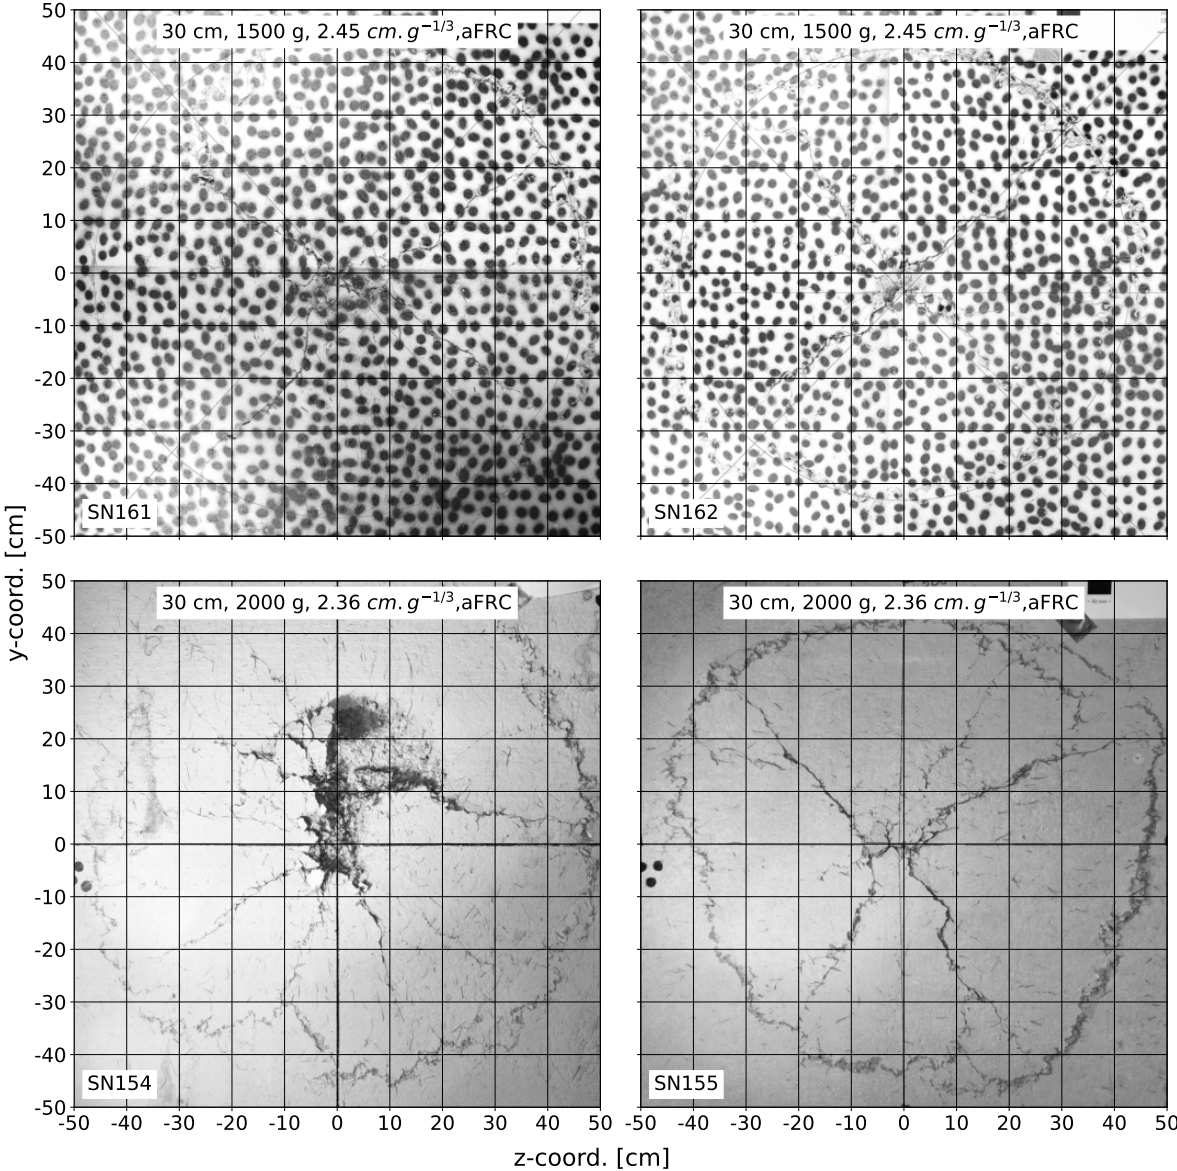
Spalling crater (with steel fibers, part 3)
